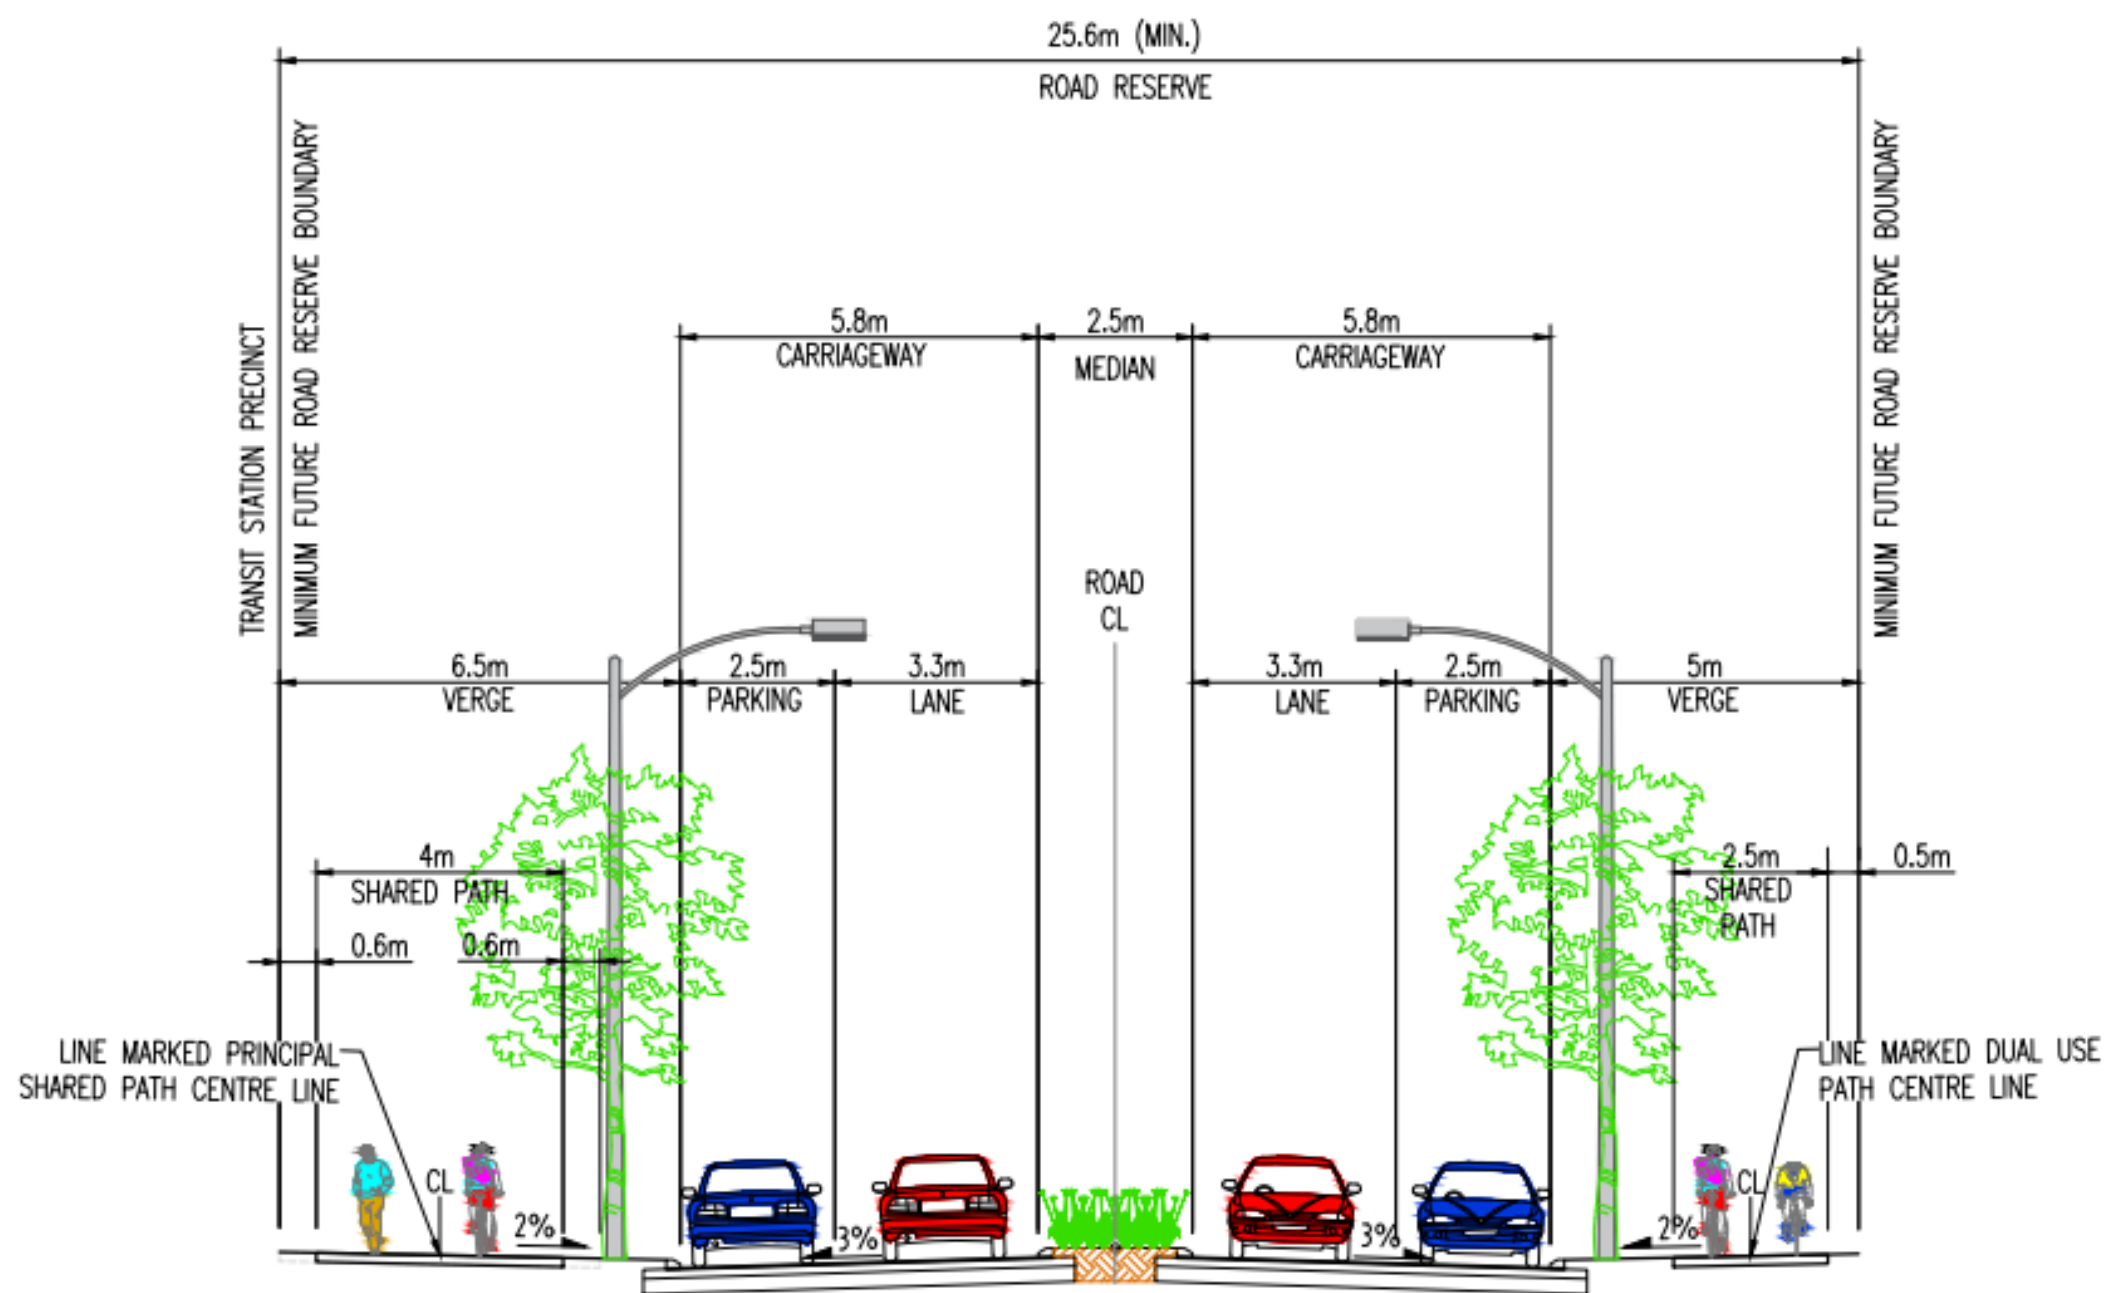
CROSS SECTION STONEY ROAD (DISTRICT CENTRE)
